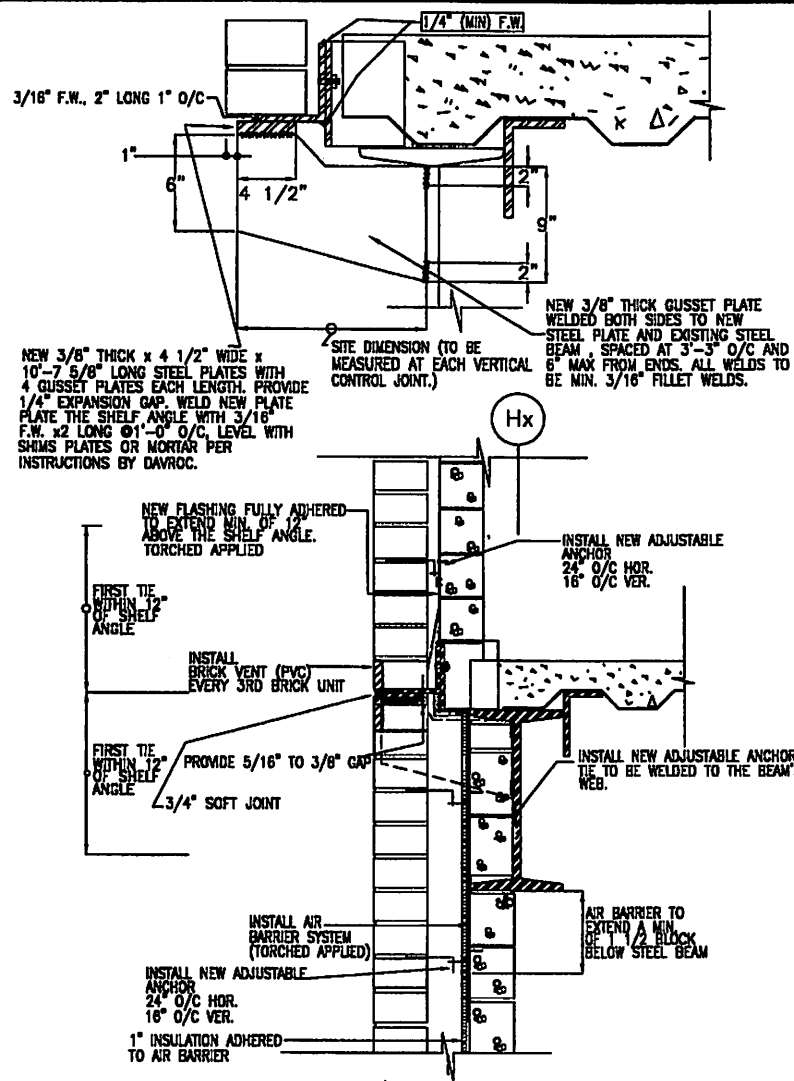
SECOND FLOOR SECTION - AS REPAIRED
